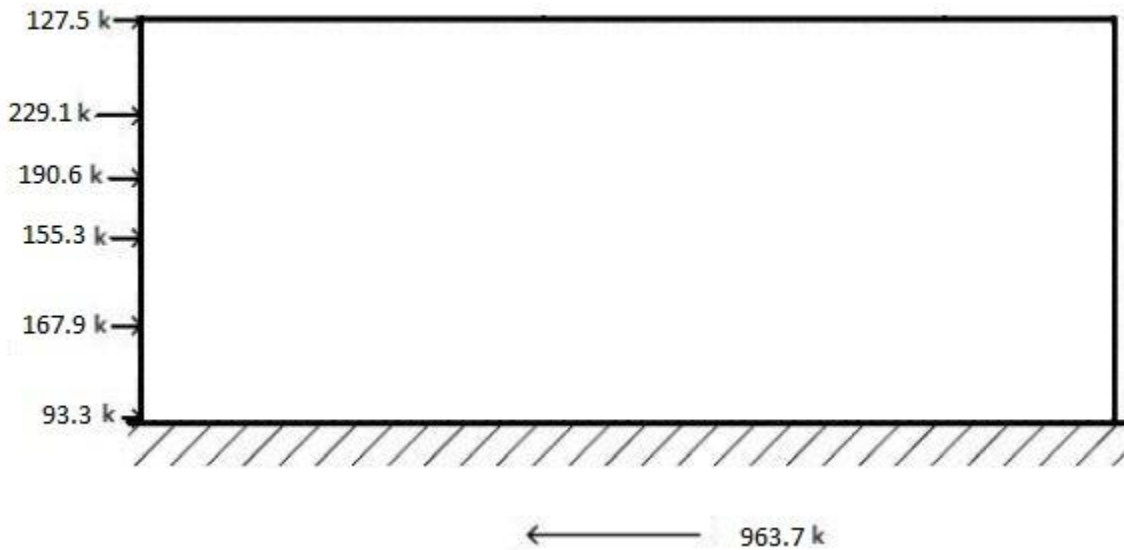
Wind Forces acting at each floor level on the East Wing, East and West facades
